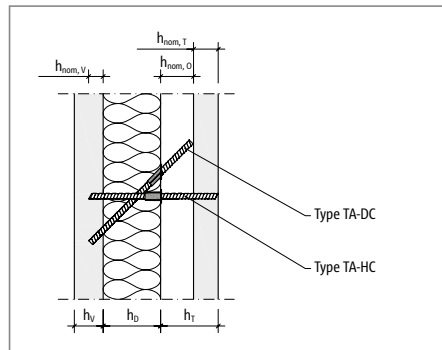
Schöck Isolink® type TA-HC, TA-DC: Cross-section details for the element wall;  $h_{nom,V} < h_V$
